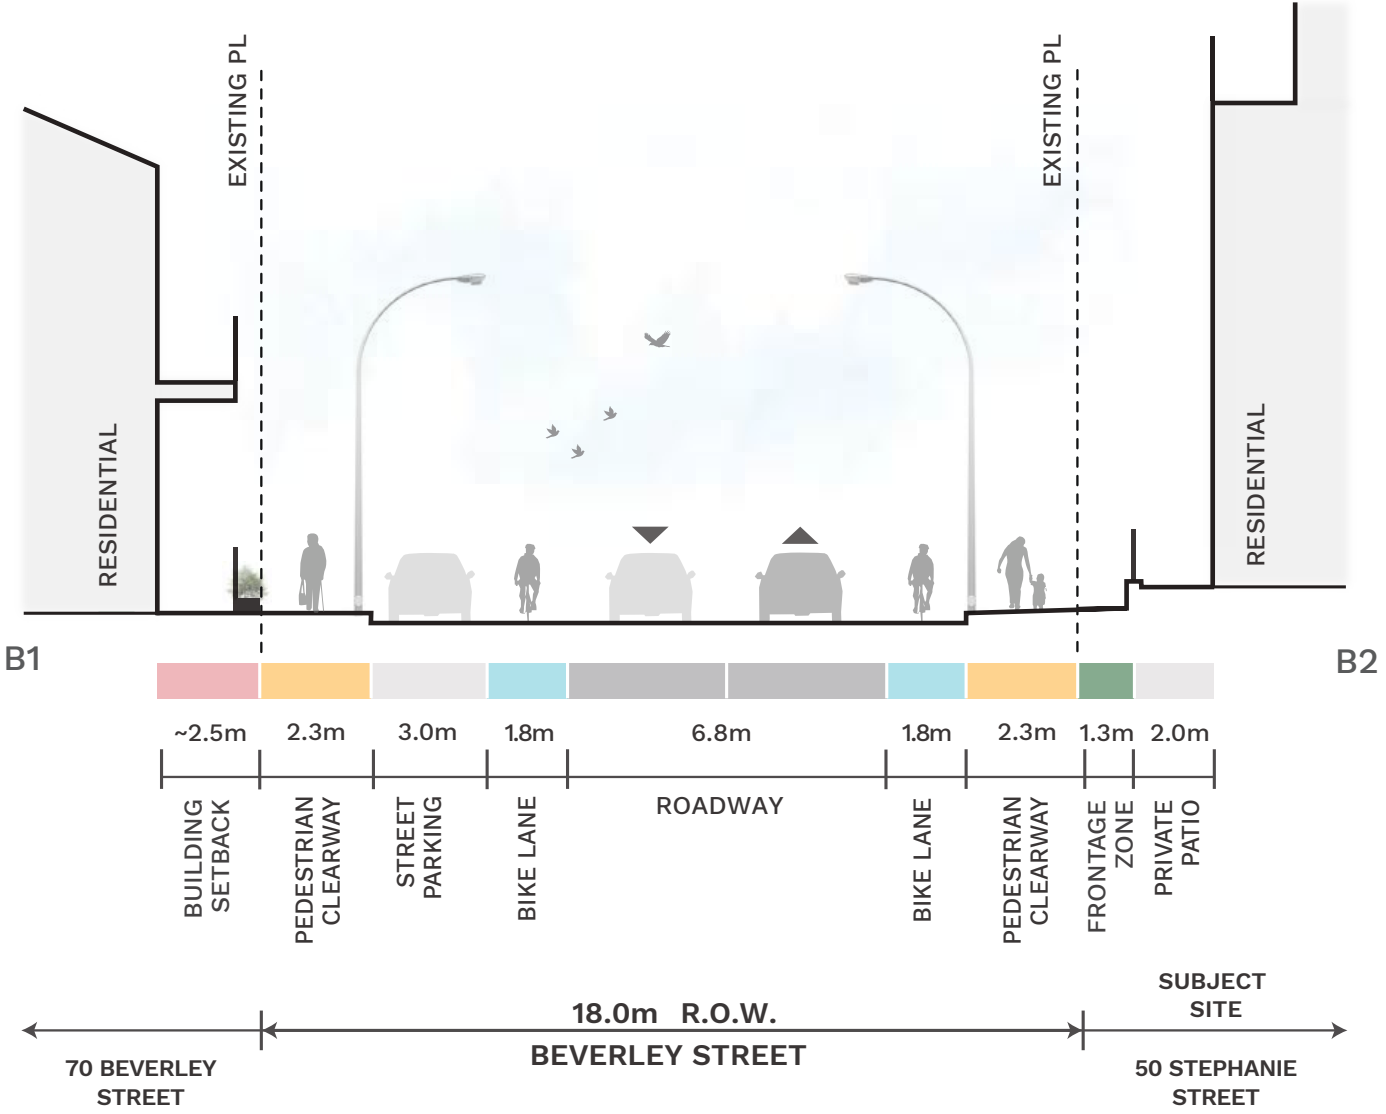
Proposed Street Section - Beverley Street (Looking North)
